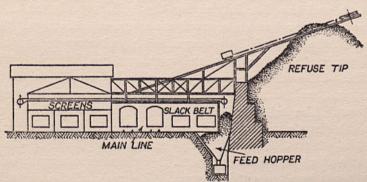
Arrangement Shewing Slack Belt Conveyor Crossing Main Line Tracks.
